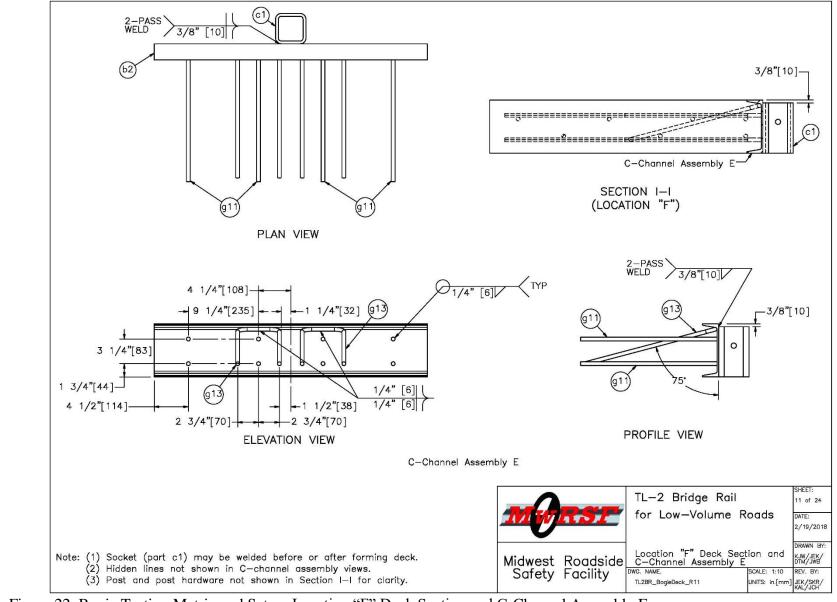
Bogie Testing Matrix and Setup, Location "F" Deck Section and C-Channel Assembly E
